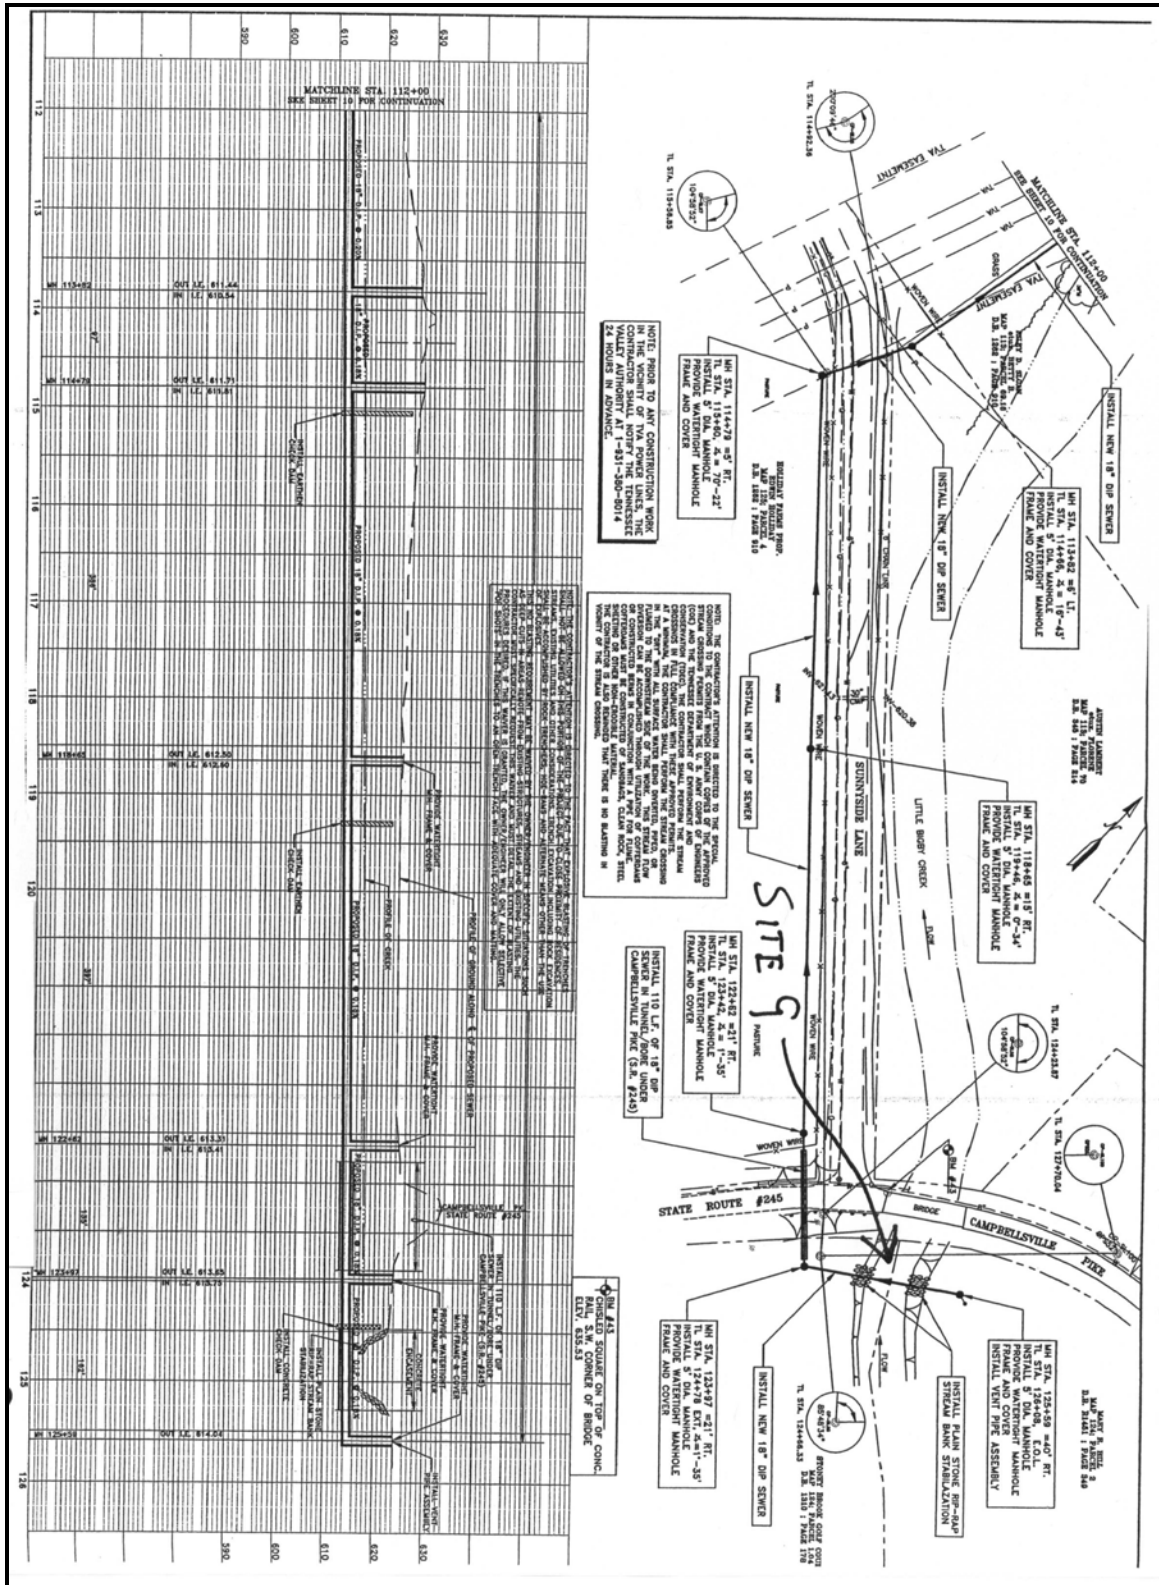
Plan sheet 11, site 9 on Little Bigby (new crossing)
